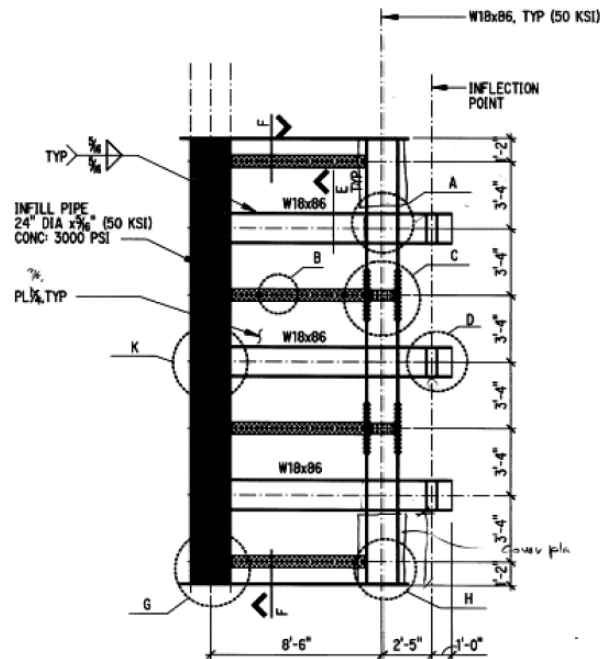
Structural Details for Specimen Two (Zhao, 2004)
